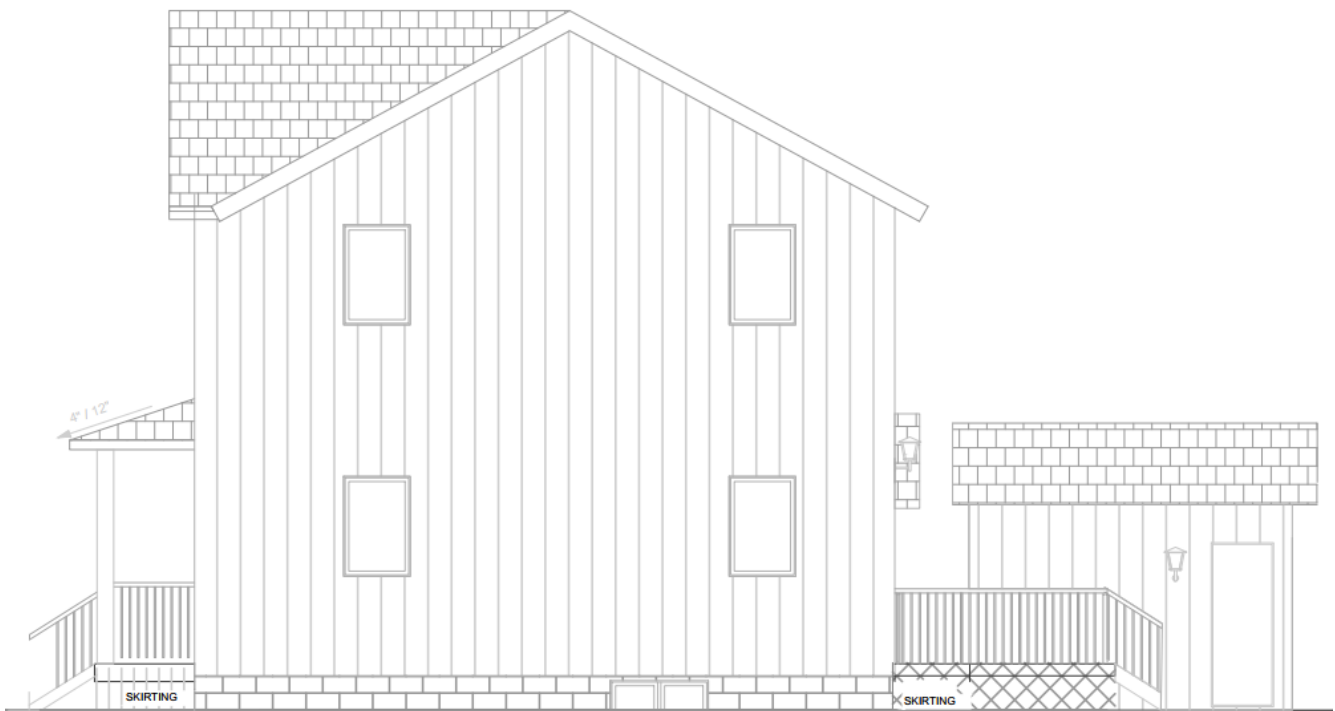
Proposed North Elevation, 40 Peter Street South. (*Image from client.*)
